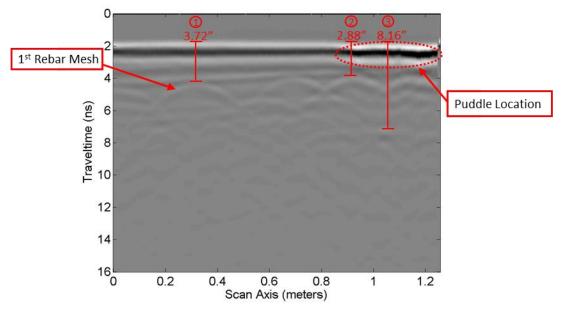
GPR Image (File 142), corresponds to a GPR scan on Area 2 on Bridge 76. Perpendicular to steel bridge deck girders.
